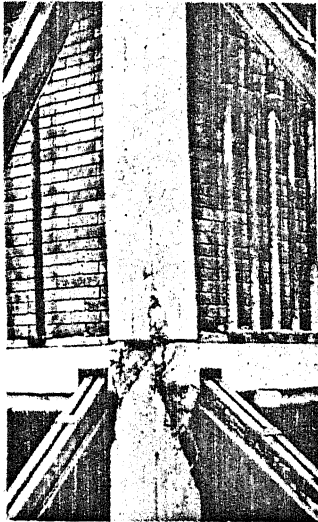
Failure of Column, Tension Cracks in Petunia II
